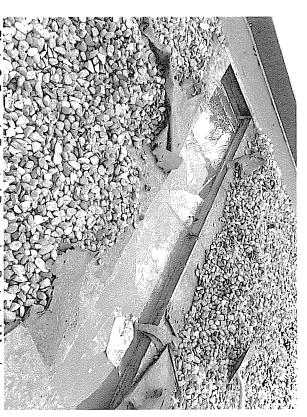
Example Targeted Removals – Protected Membrane Assembly with ballast, fabric, and insulation removed to exposed membrane for visual inspection.
